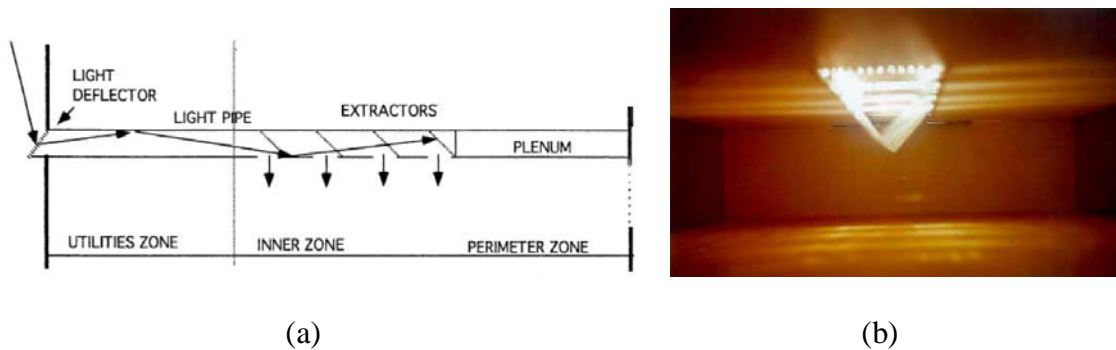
Light pipe proposed for Waterfront House. (a) Schematic section, (b) laser cut panels were used to extract light at different points. *Source: Hansen et al., (2002).
